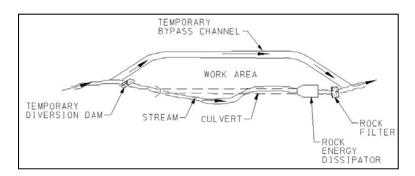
Example Bypass Channel Used For Culvert Installation
